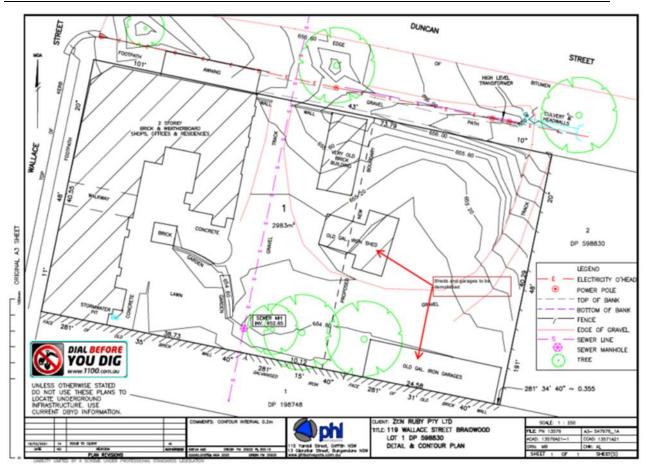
Survey Plan showing proposed subdivision boundary (dotted black) and existing buildings to be demolished indicated by red arrows.
